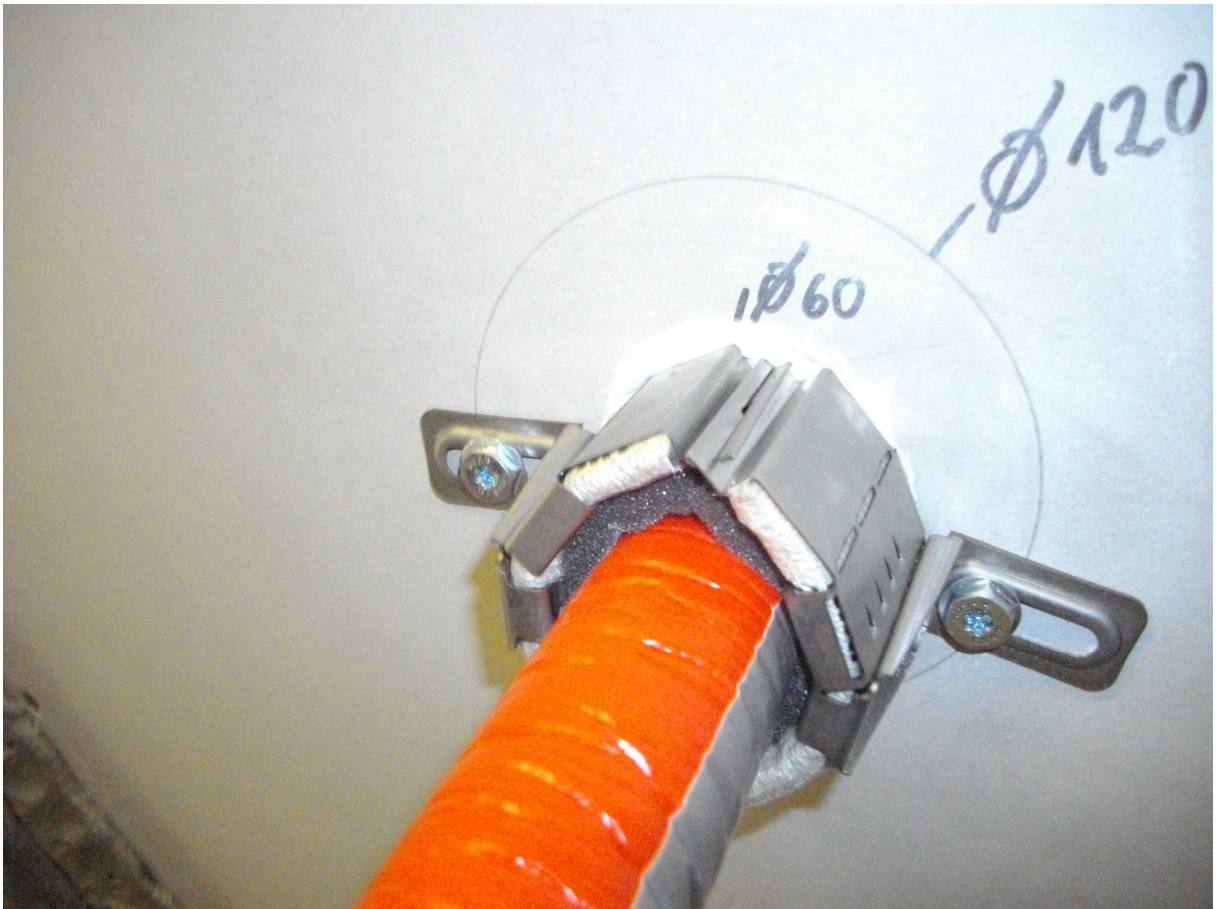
Pipe DN 32 in tube insulation with attached Hilti Firestop Collar Endless CFS-C EL
